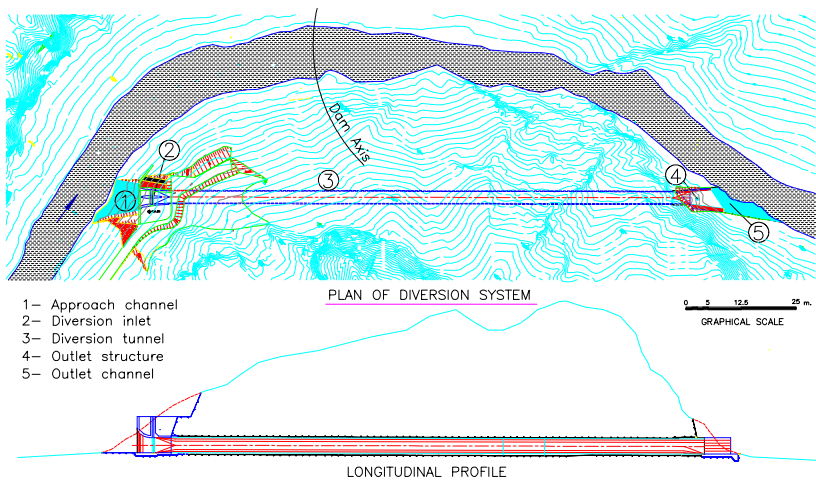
Plan and longitudinal profile of a diversion tunnel (Sazbon dam project – Iran)
